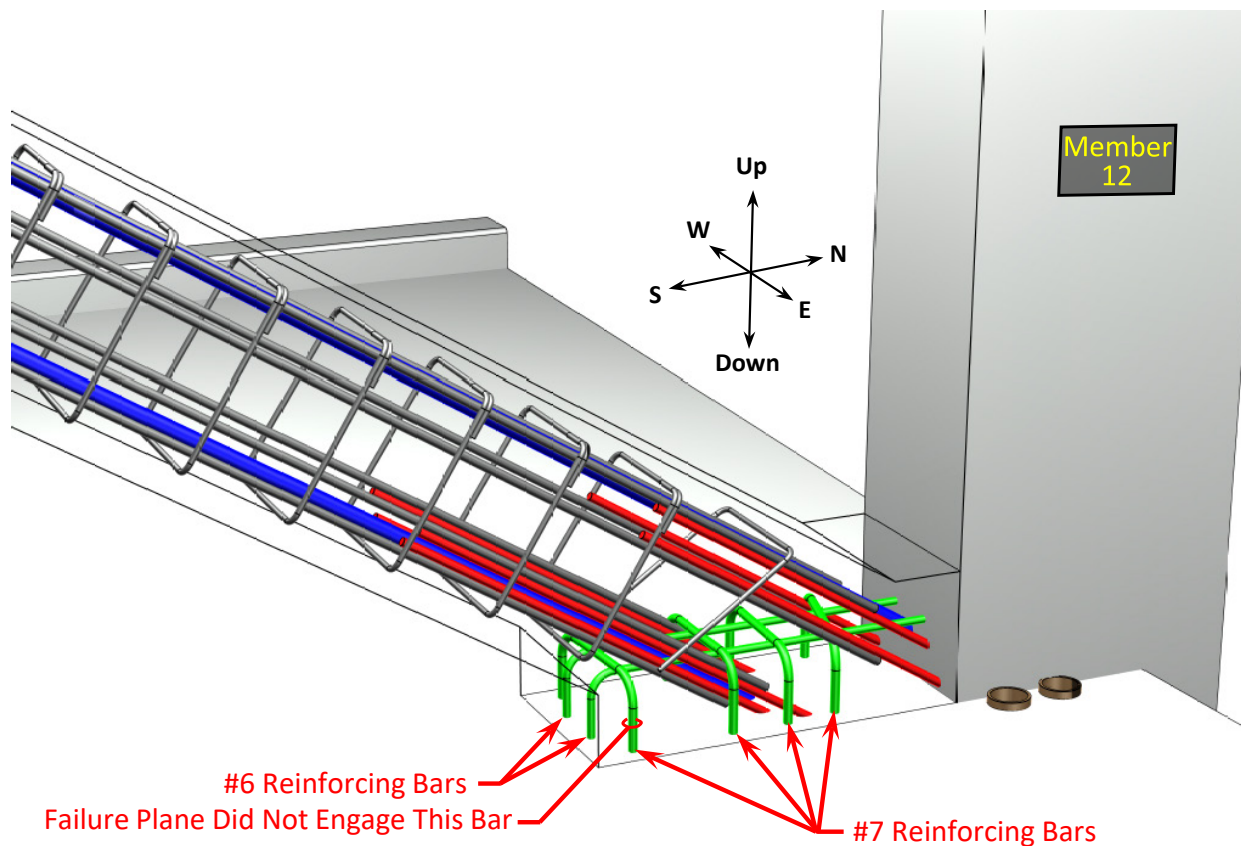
Illustration showing the steel reinforcing bars passing from the deck into the base of truss member 11.
